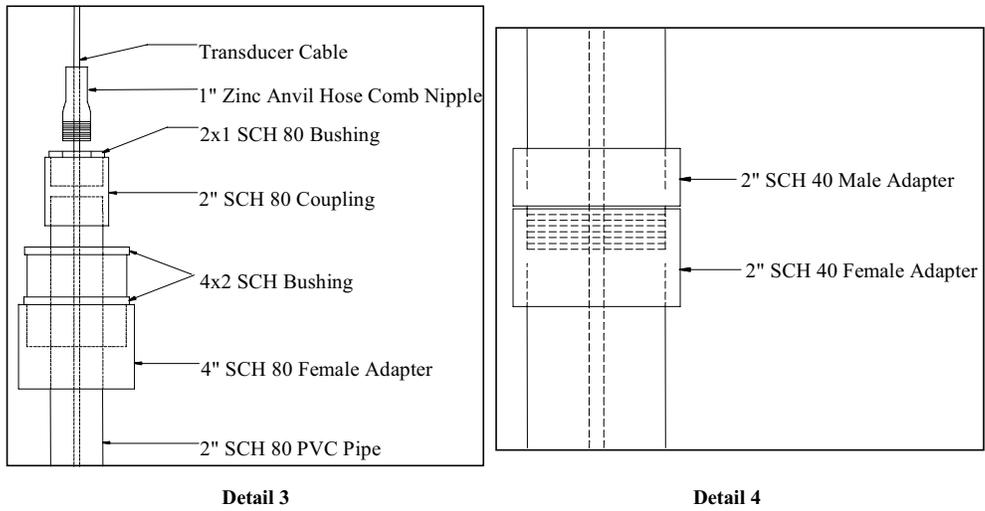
Schematics of the pressure transducer assembly (Details 3 and 4)
